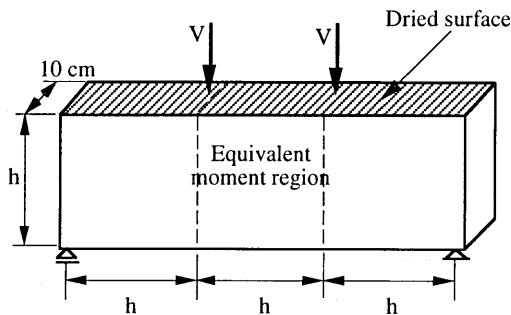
Plain Concrete Beam Subjected to Four-Point Loading
